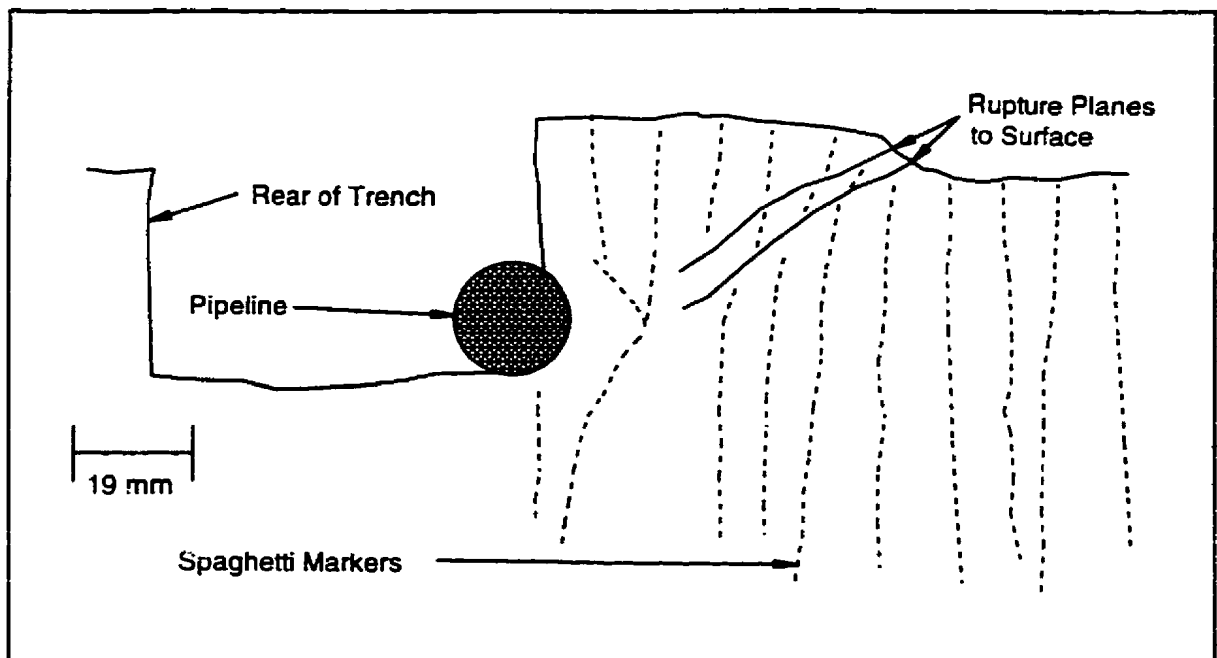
Sketch of excavated cross-section along mid length of model pipeline #4, fine sand backfill, Test 09.
